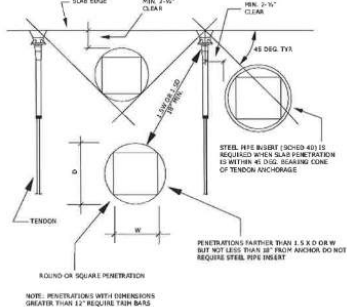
Reinforcement at anchorage zone penetrations. (Note: 1 in. = 25.4 mm.)
